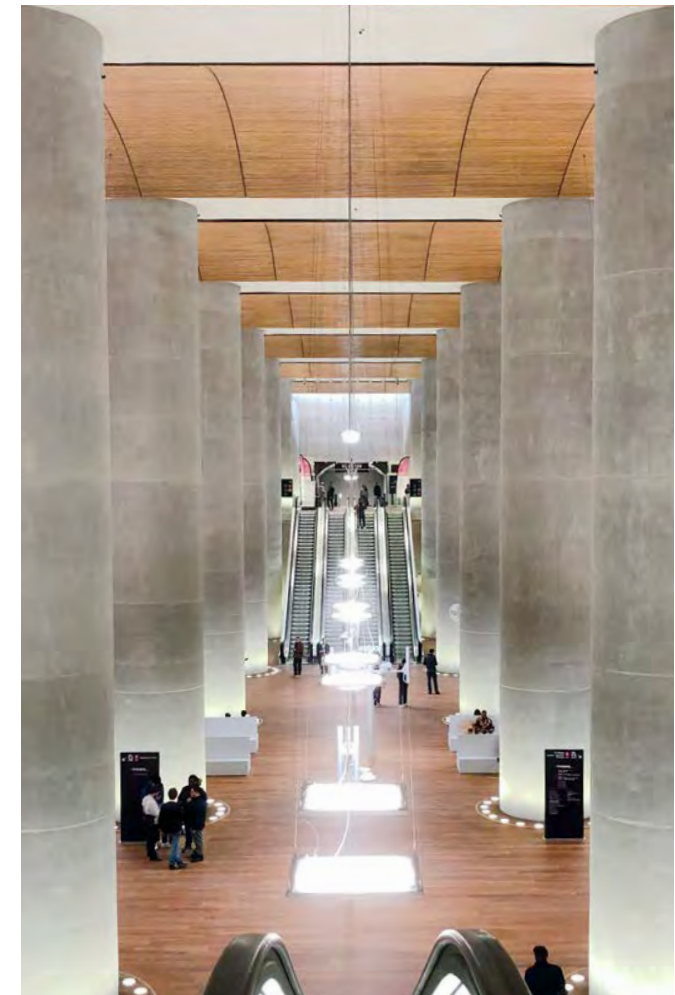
Timber Floor and Soffit - Paris, La Defense RER E Station
